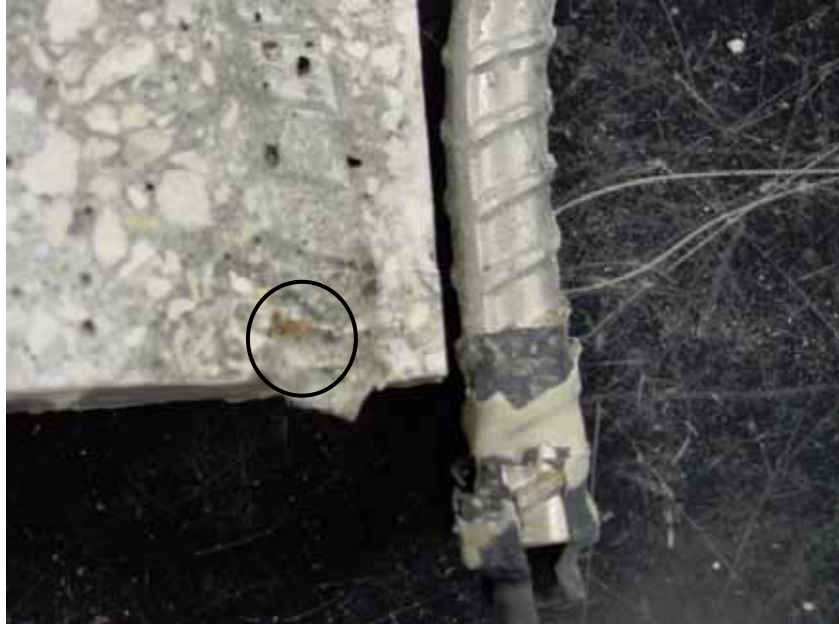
Photo. Top bent bar trace in concrete for specimen MS-CBDB-MMFX-2-A.
